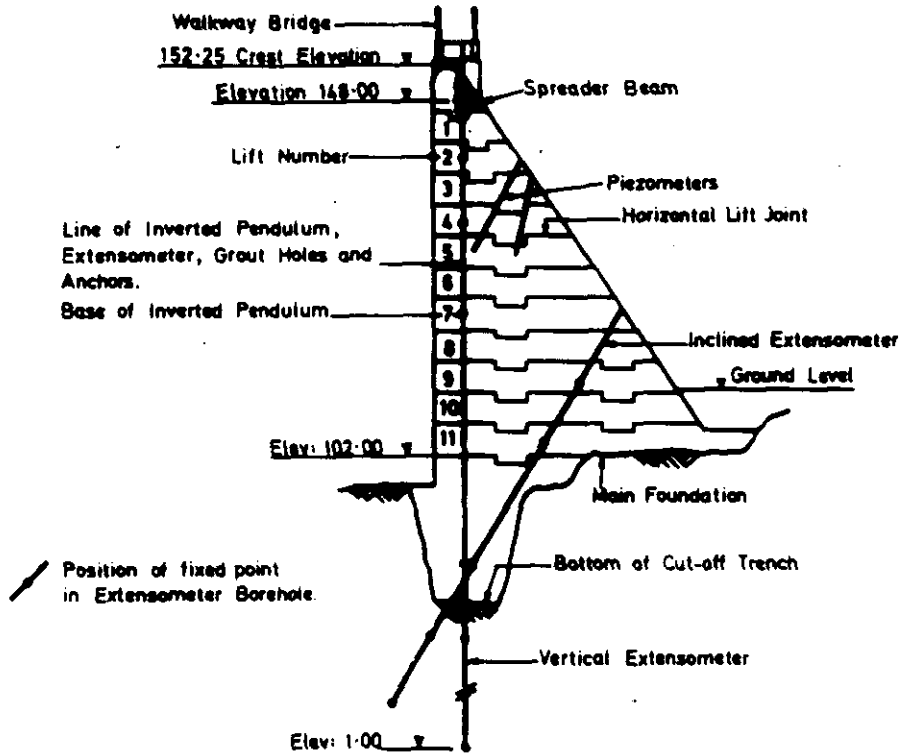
Section through Block 6 showing Arrangement of Anchors, Grout Holes and Instrumentation
